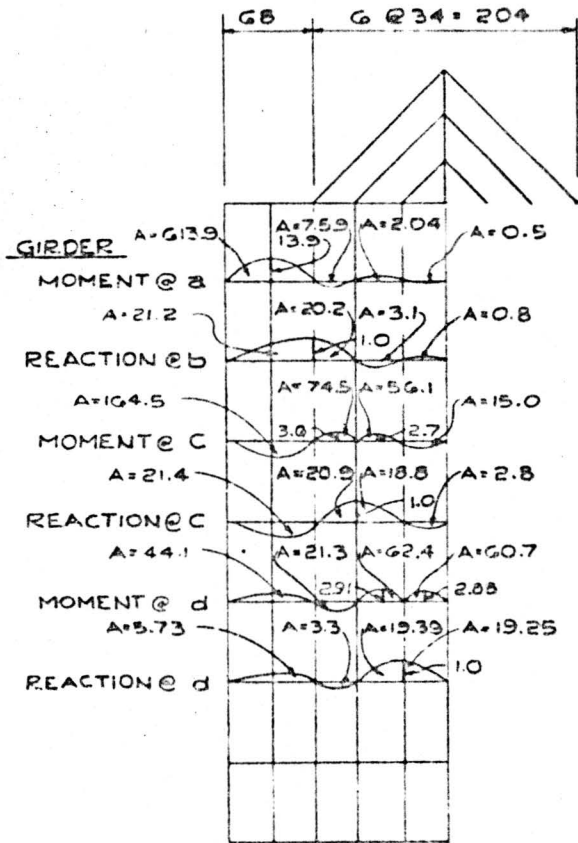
INFLUENCE DIAGRAMS FOR STAYED GIRDER BRIDGE
